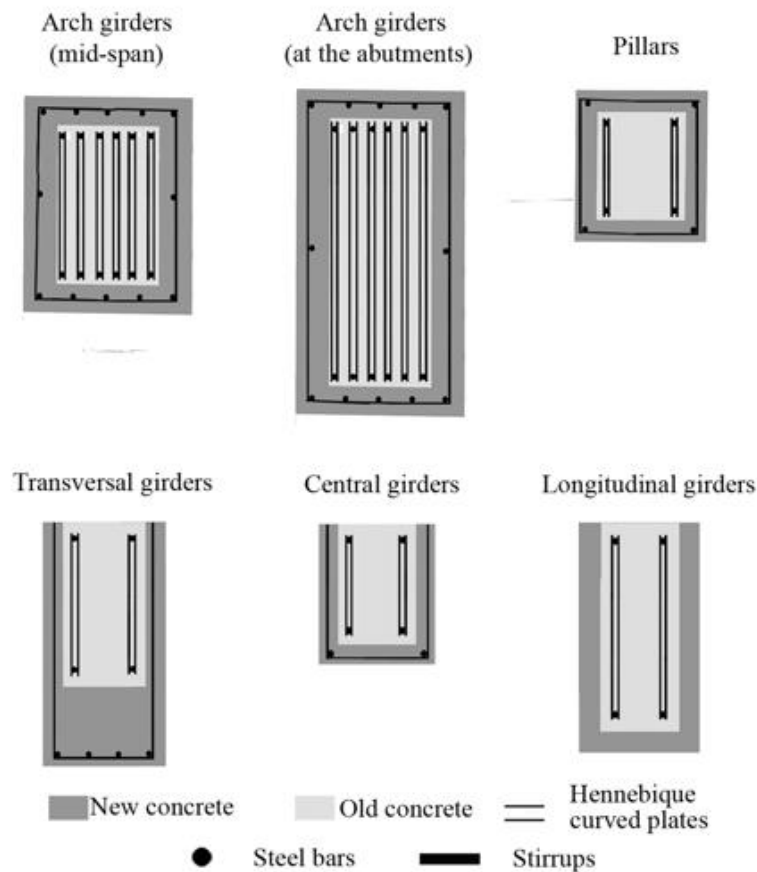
Cross-sections with concrete layers and reinforcement (steel bars, stirrups and Hennebique curved plates) of the structural components. Adapted from [7].
